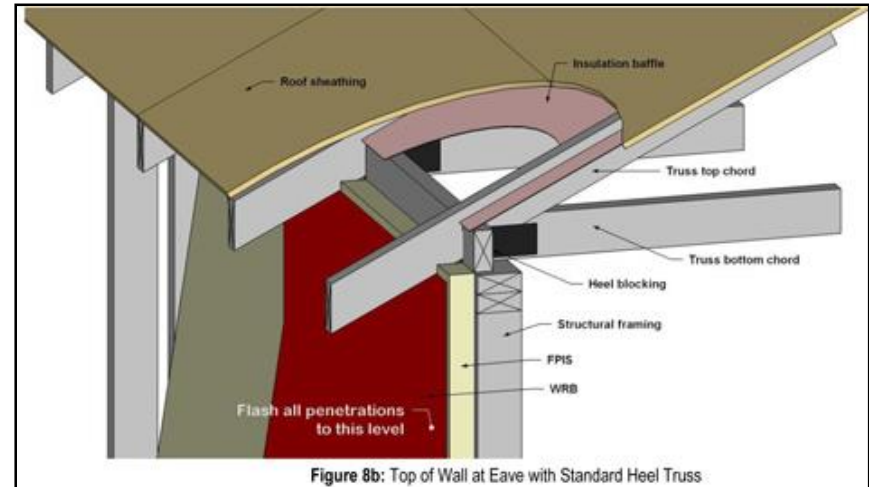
Top of Wall at Eave with Standard Heel Truss
